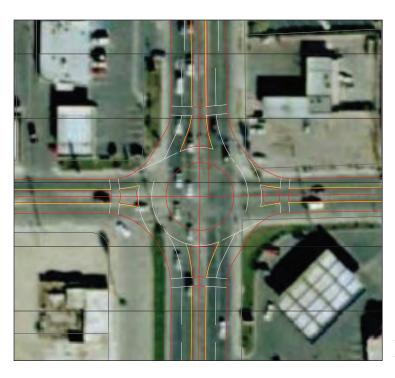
Roundabout design layout for Harrison Avenue and Avenue 52.
